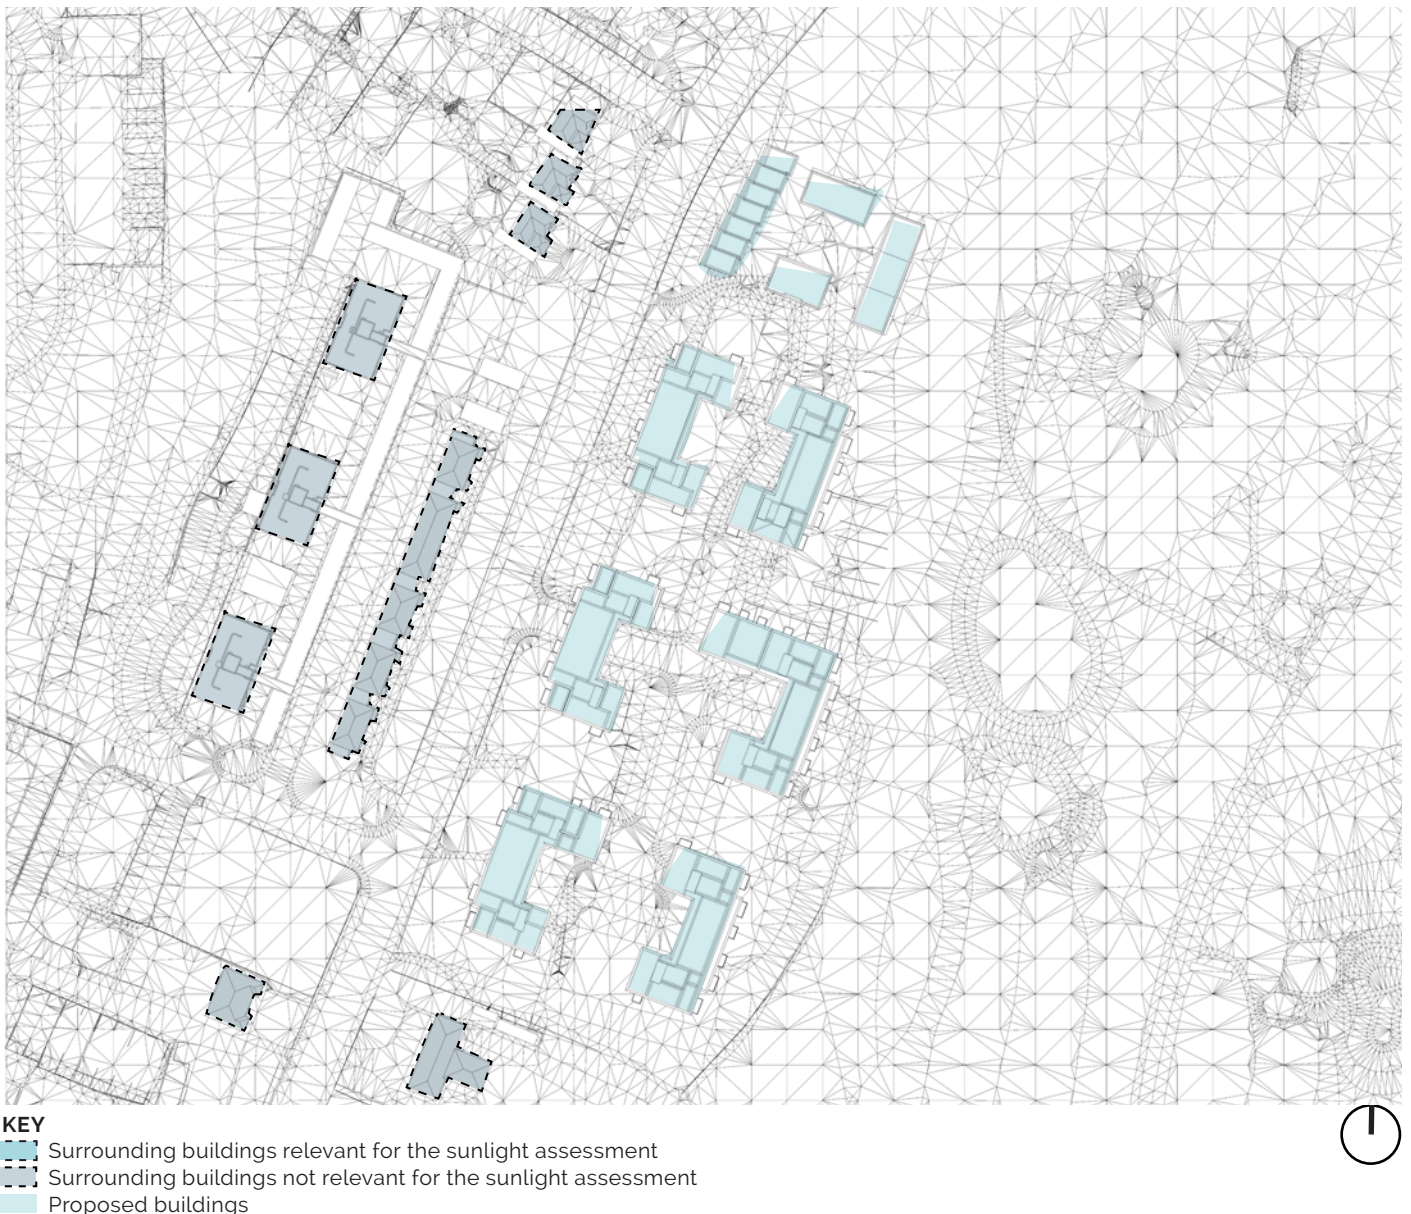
Site plan indicating the existing buildings tested for the sunlight assessment
